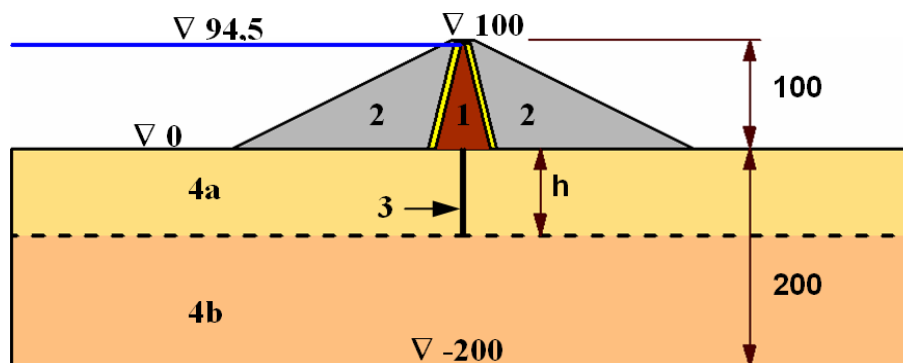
Design diagram of the wall in foundation of an embankment dam:
